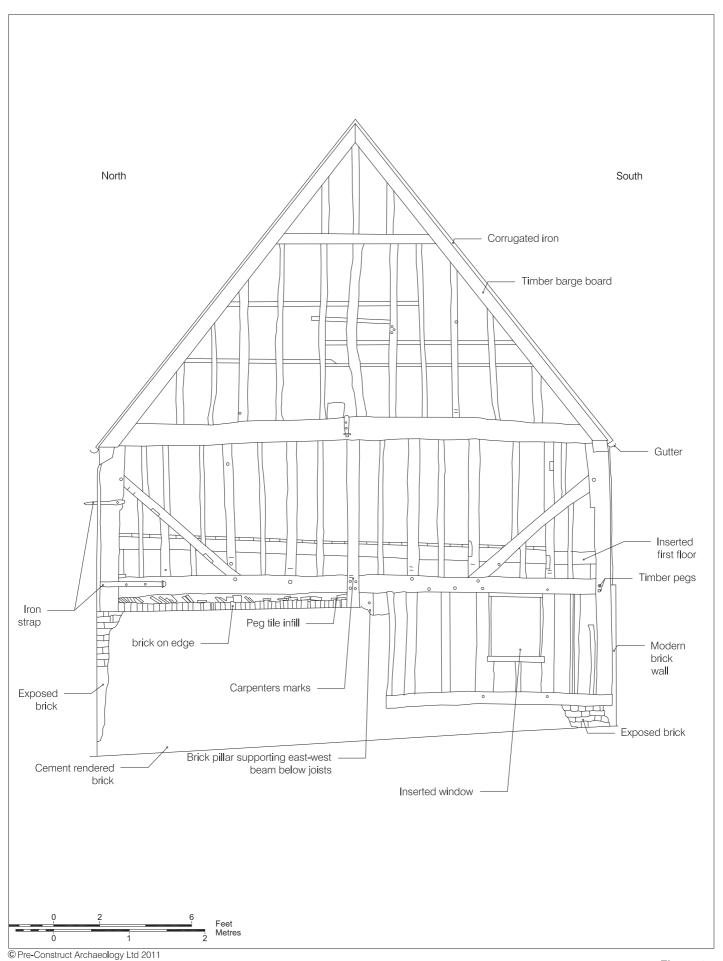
West elevation after cement render removed Cottage (Building 4) Musgrove Maltings Baldock 1:50 at A4
